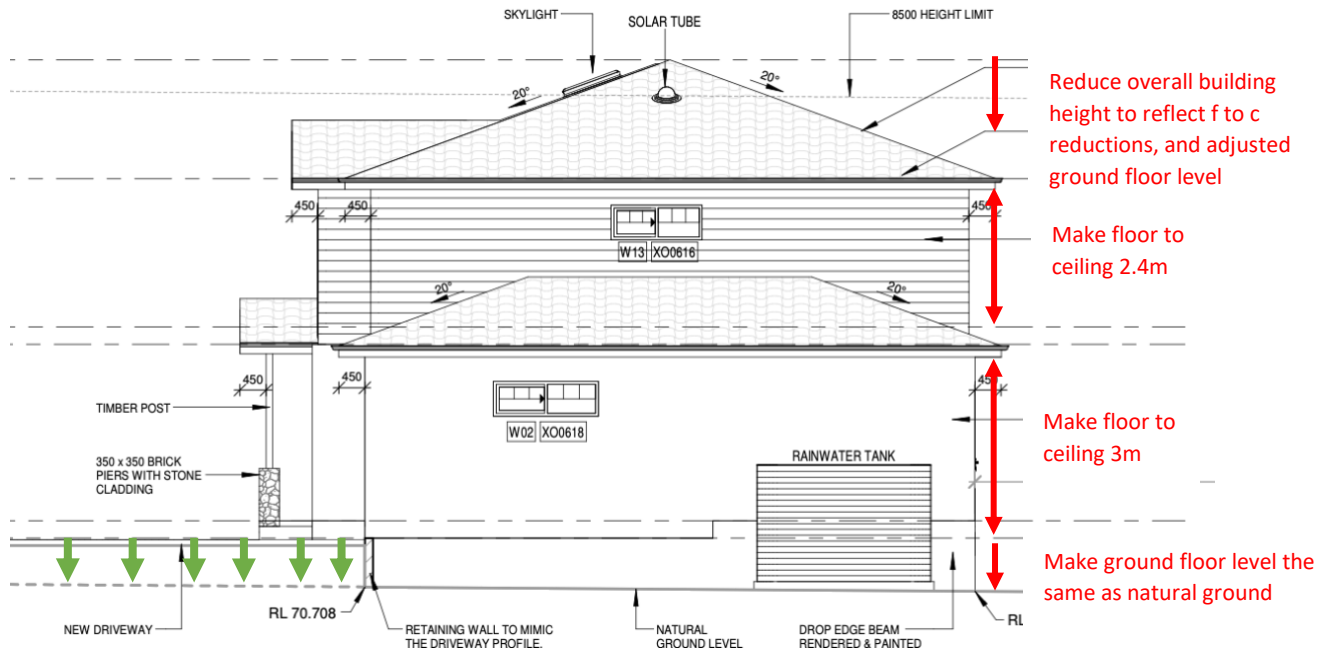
Recommendations – southern elevation (Corona Projects, 2021)
